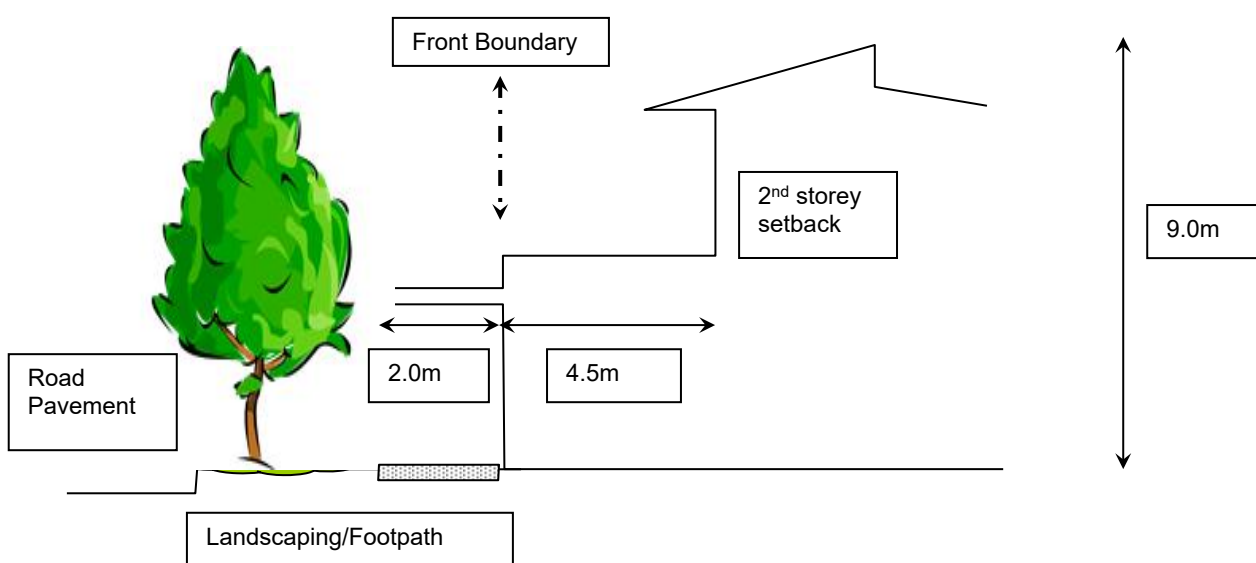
South Jonson Street – Setbacks relating to Building Forms
